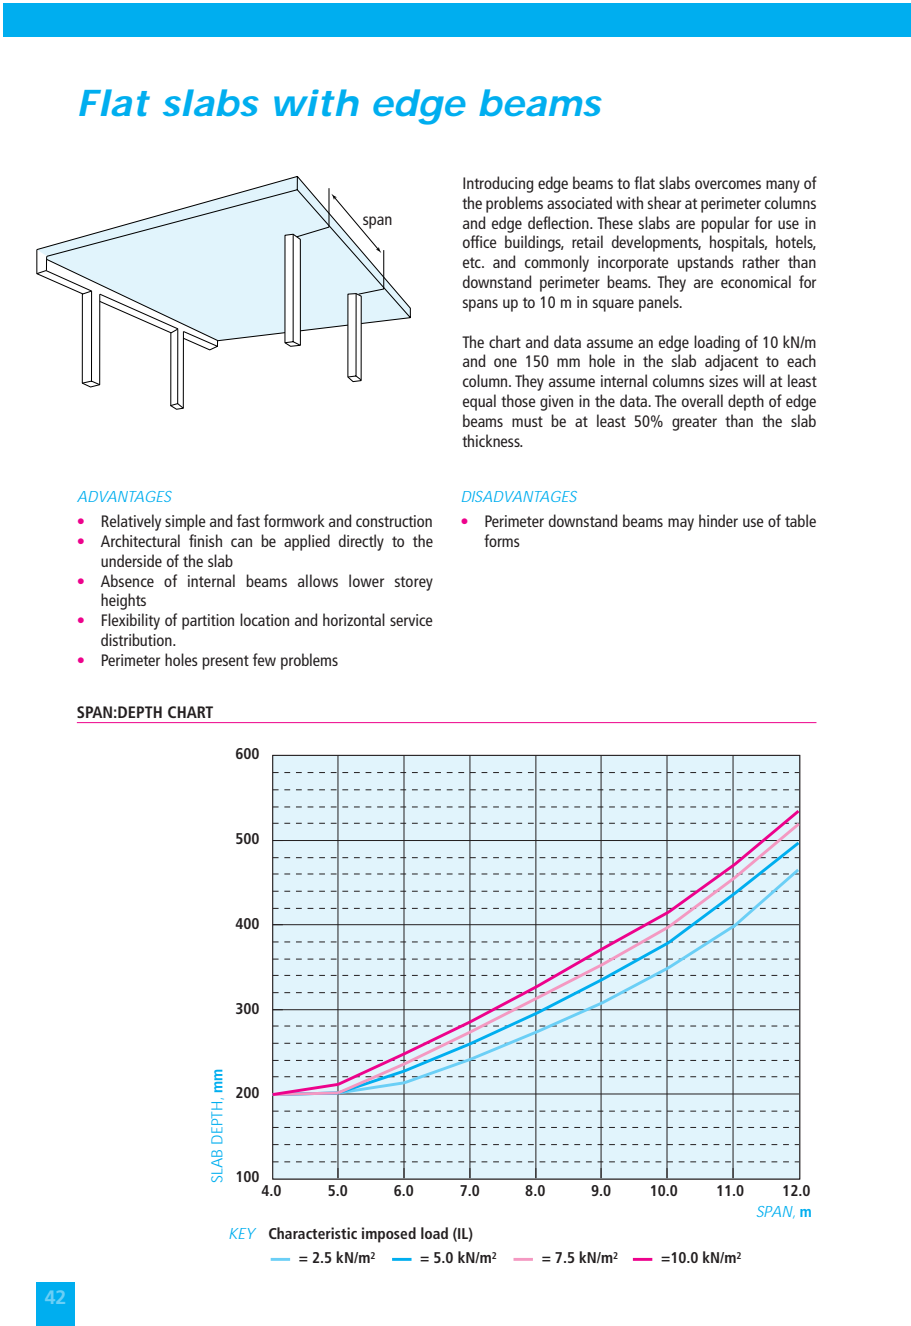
Design information for reinforced concrete structure with flat slab floors - Page 1 (Goodchild, 1997)
